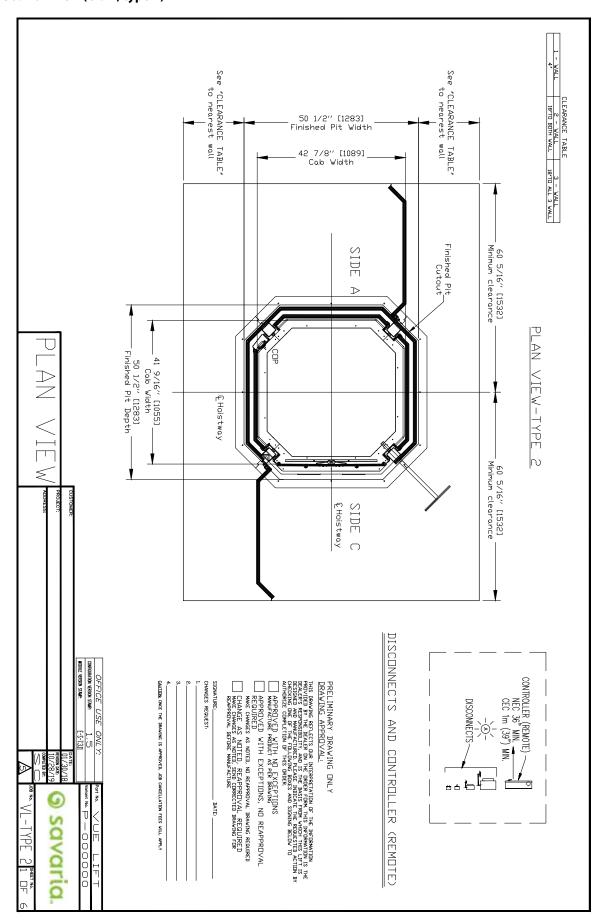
Pit/bottom floor/thru-floor view (OGM, type 2)
